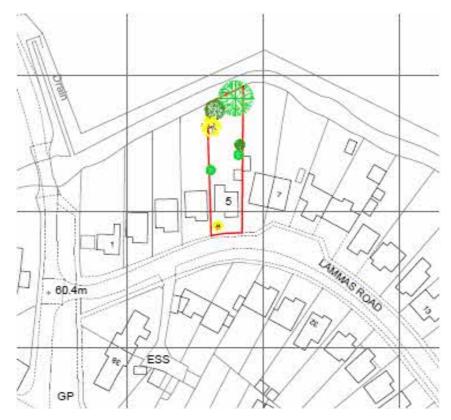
Sitelocation plan, as indicated with North topmost. (source: open street map
